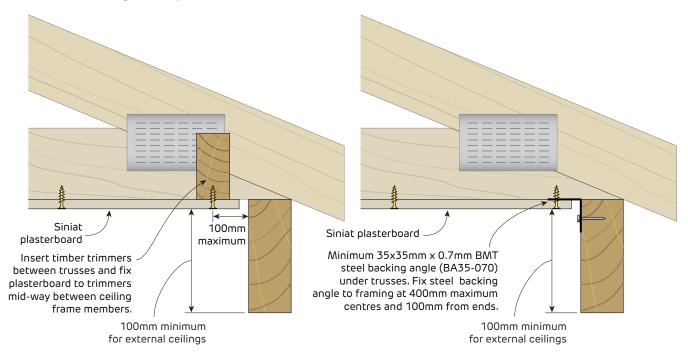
Plasterboard Ceiling Fixed to Roof Truss With perimeter timber trimmers between trusses
